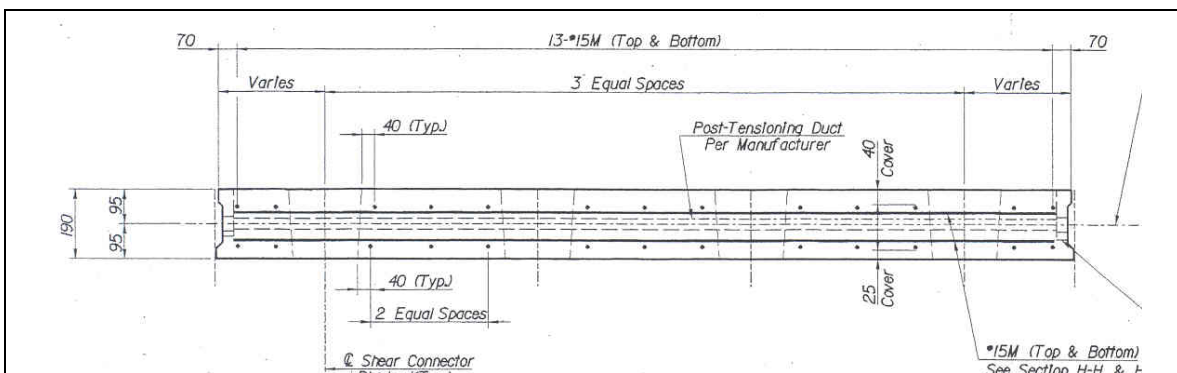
Typical deck longitudinal reinforcement for a bridge in West Hartford, CT-DOT, 1997)
